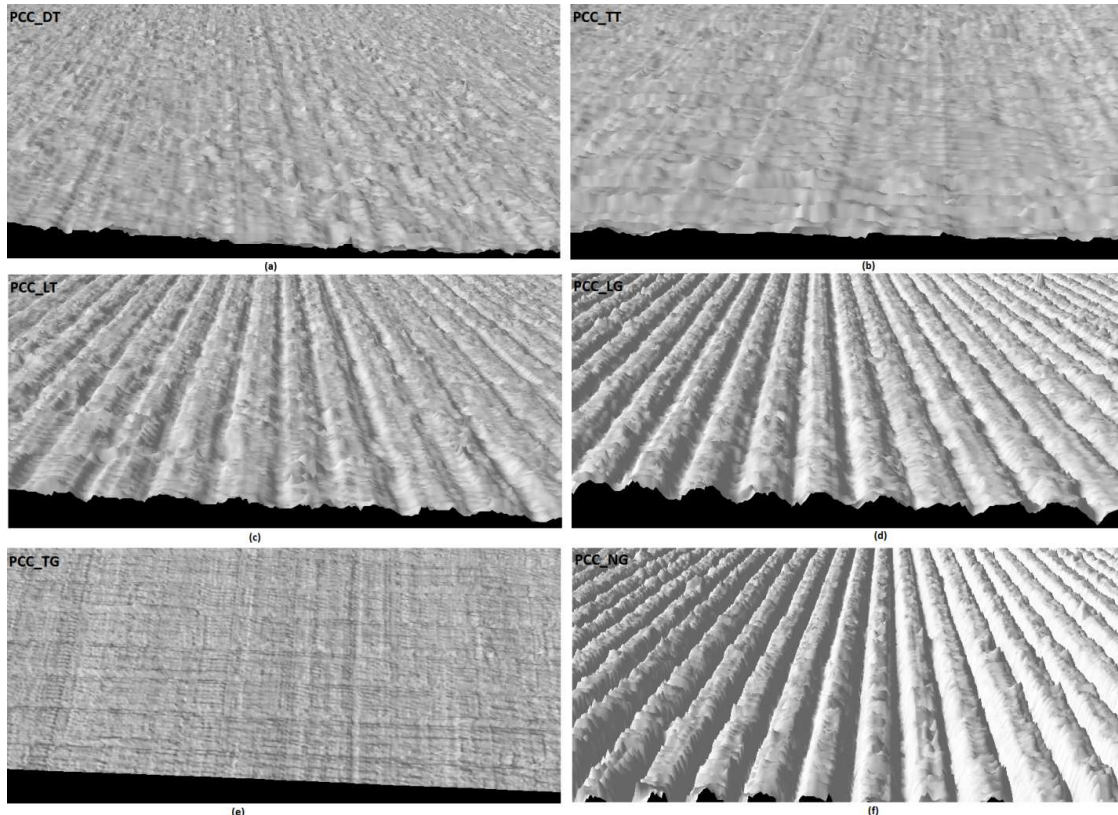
3D rendering of rigid pavement test specimens from 3D Ultra
